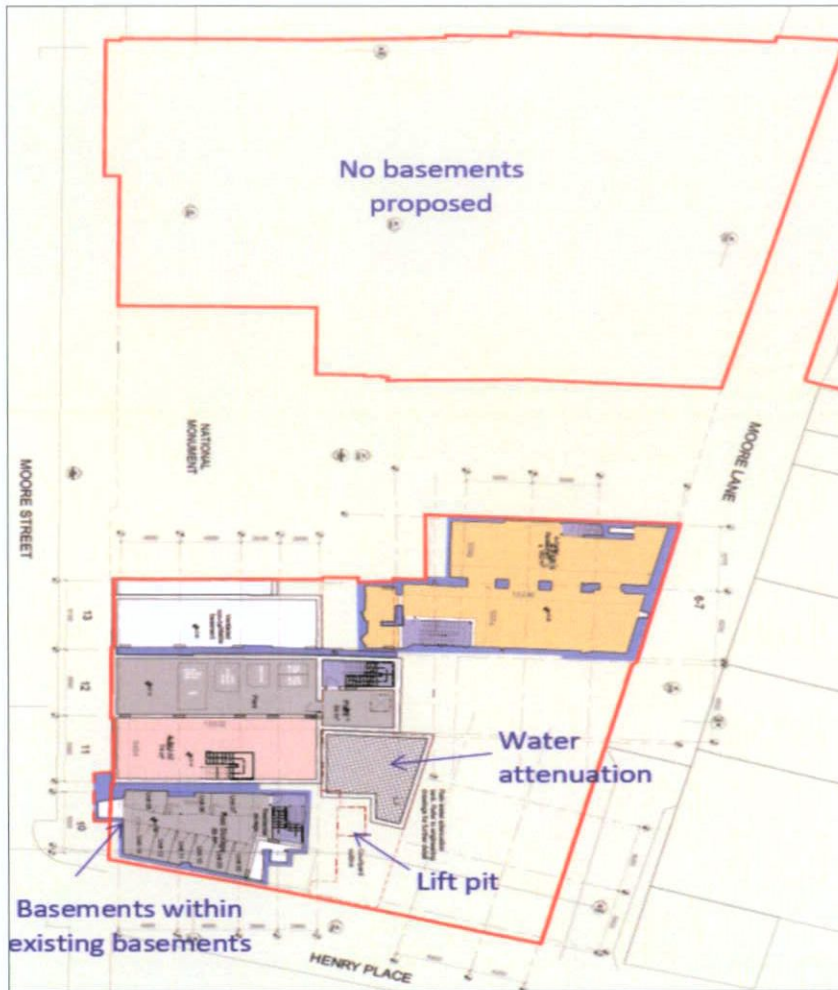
Site 4, proposed basement slabs, walls and columns (blue shows existing fabric).
